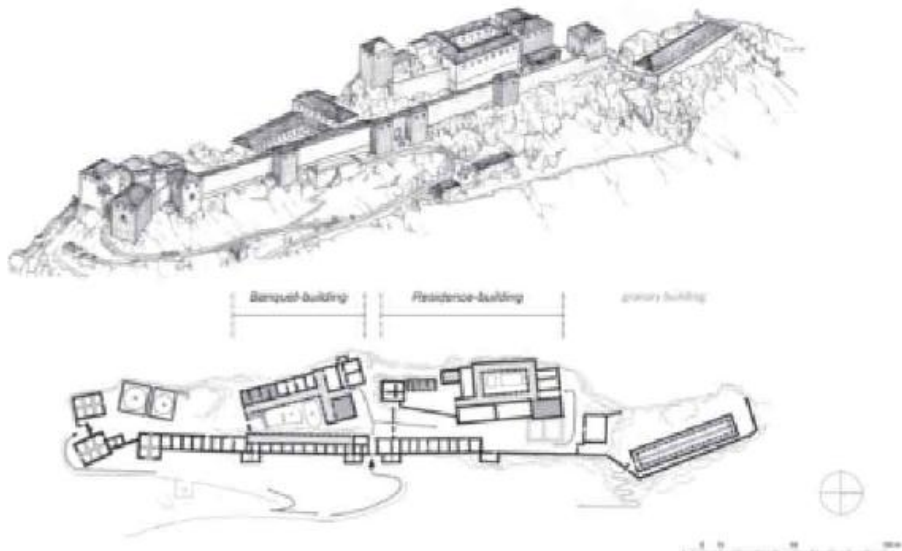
Karasis, Upper Castle – above: reconstruction, below: schematic plan (T. Radt).
